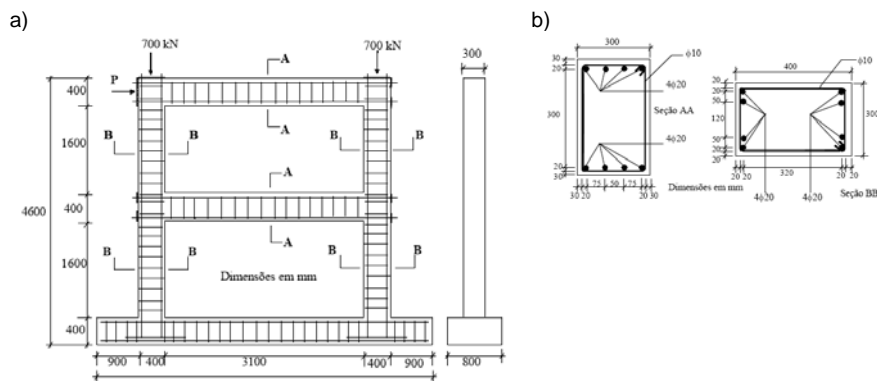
Details of the test frame³ - a) the frame dimensions and details, b) Sections A and B
